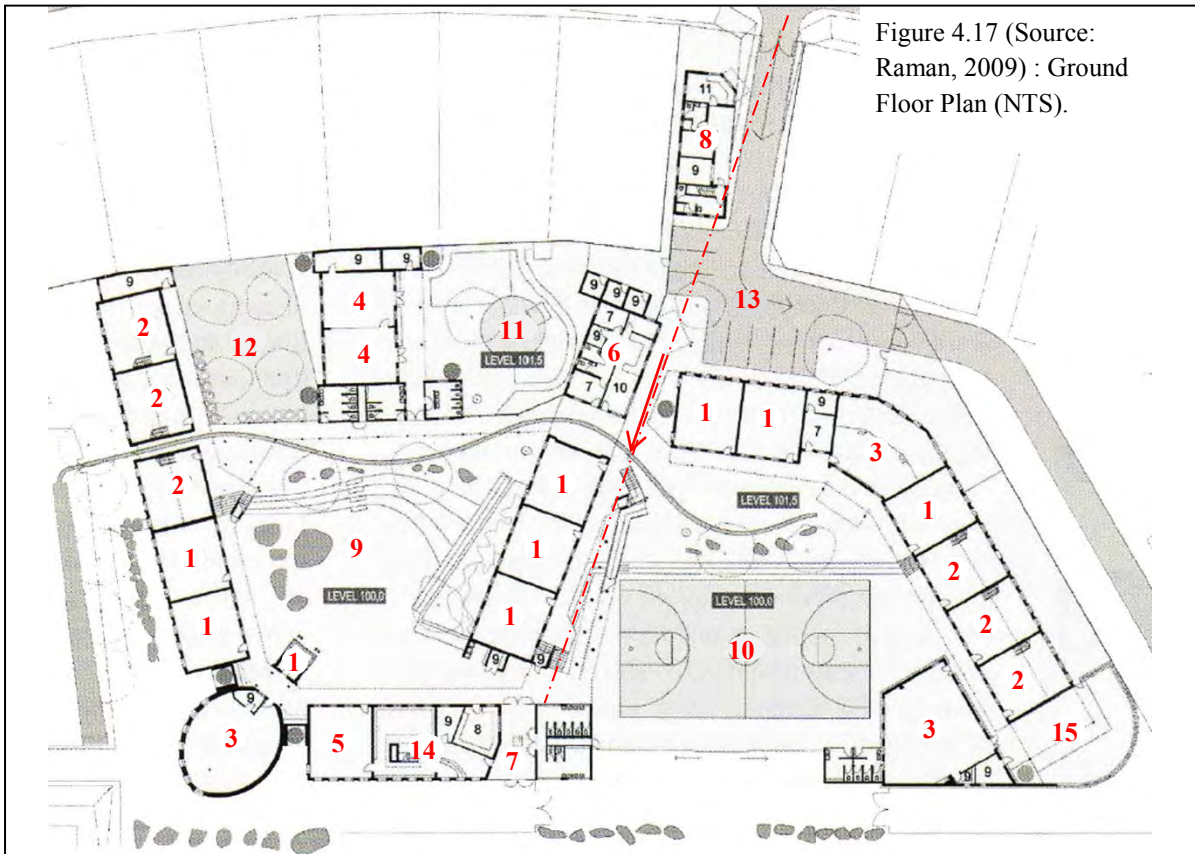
(Source: Raman, 2009) : Ground Floor Plan (NTS).
